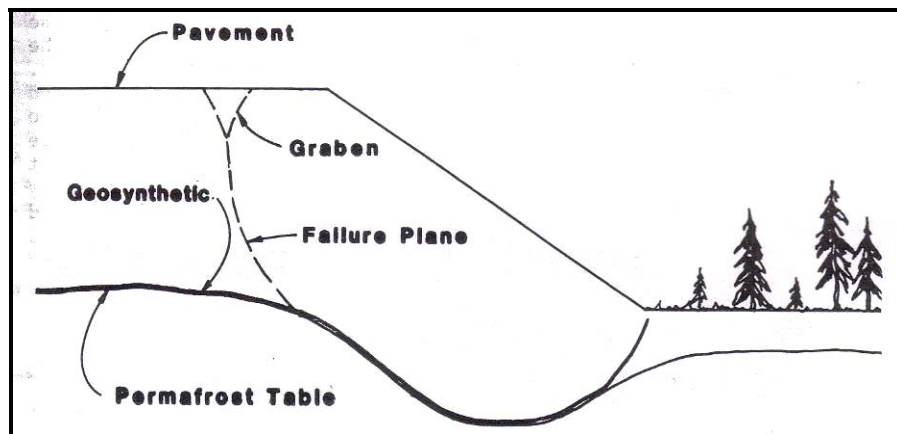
Embankment reinforced with a single layer of geotextile (Rooney and Johnson, 1988)
